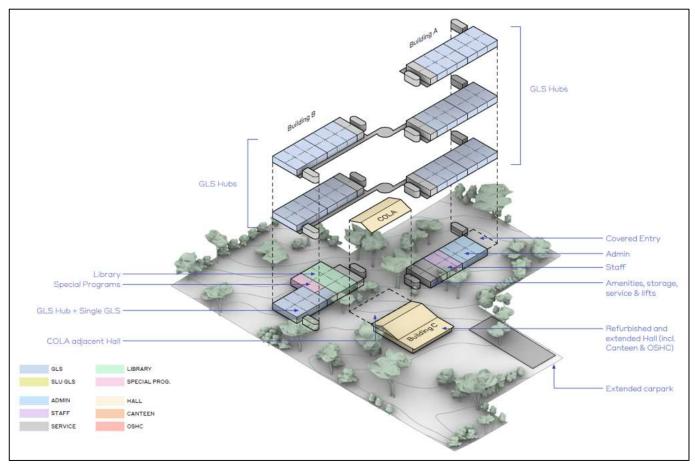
| Overview of site layout and planning (Source: Applicant's EIS 2023)
